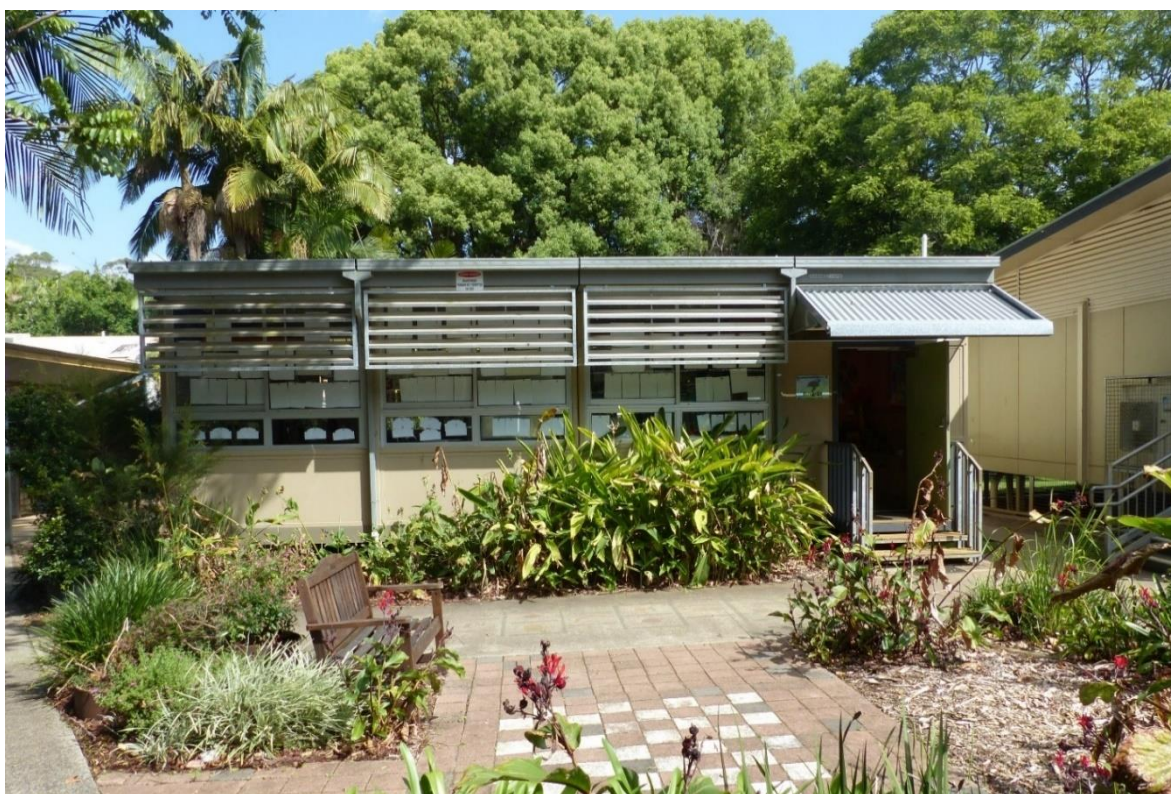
Proposed location of new classroom building, looking west from existing classroom building.
